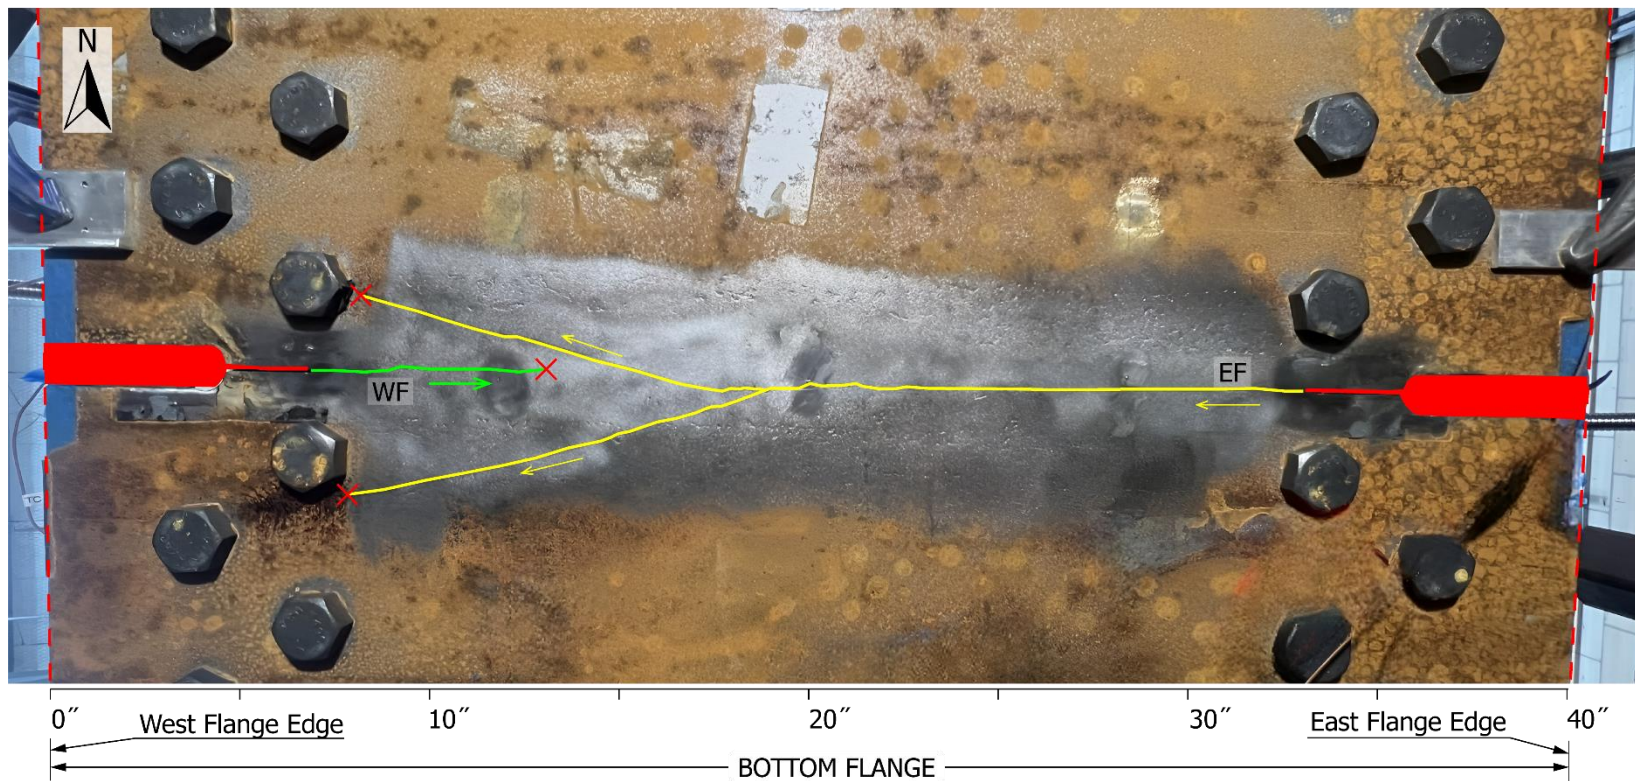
Specimen B2: fractured bottom flange plate after Fracture Test
